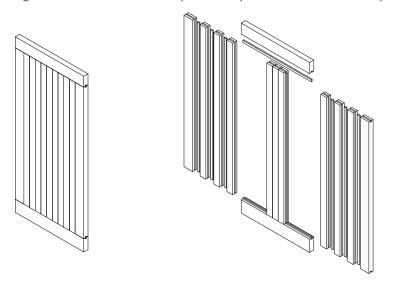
Exterior Door - Option B: Spline - Assembled & Exploded Views
